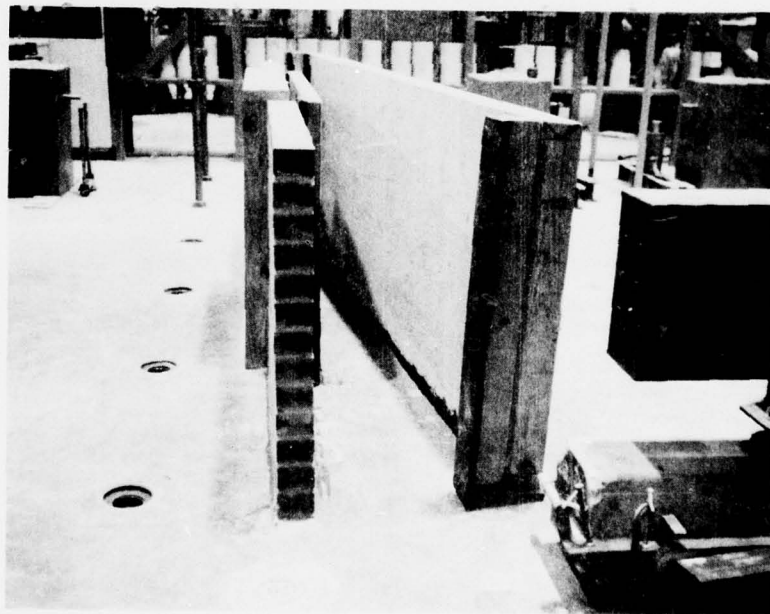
View 1 - bulkhead to contain water against the wall and closure
